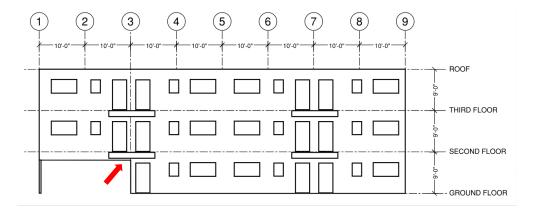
Elevation of short-side-open archetype with arrow pointing at critical location for second-floor diaphragm shear and flexure.
